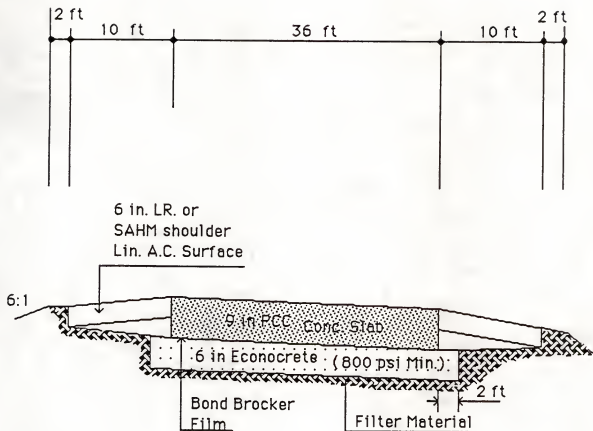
TYPICAL PAVEMENT SECTION OF I-10 CONCRETE PAVEMENT USING A LIME AND CEMENT TREATED SUBBASE
